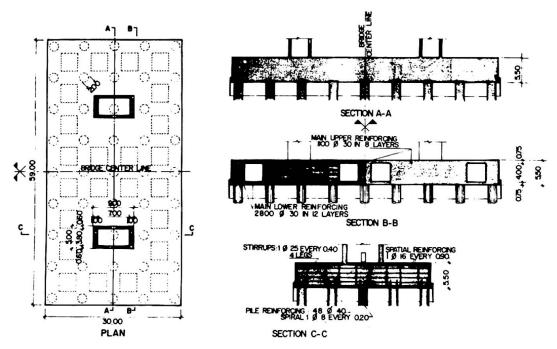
Paraná Guazú Main Piers Pile Caps
